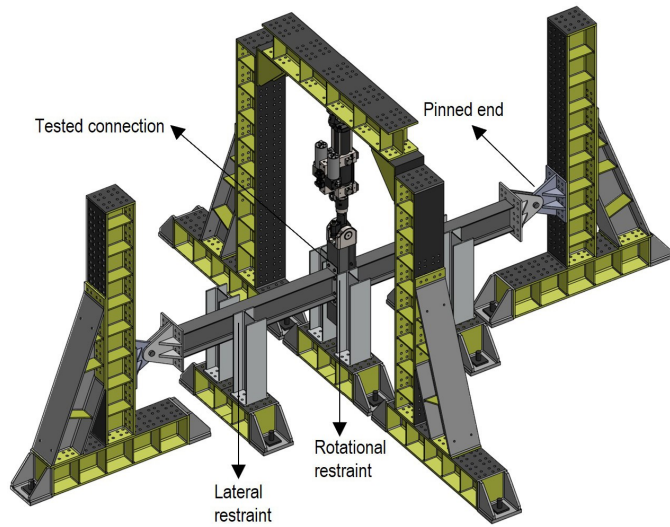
The test arrangement for the quasi-static two-sided beam-to-column connection tests
